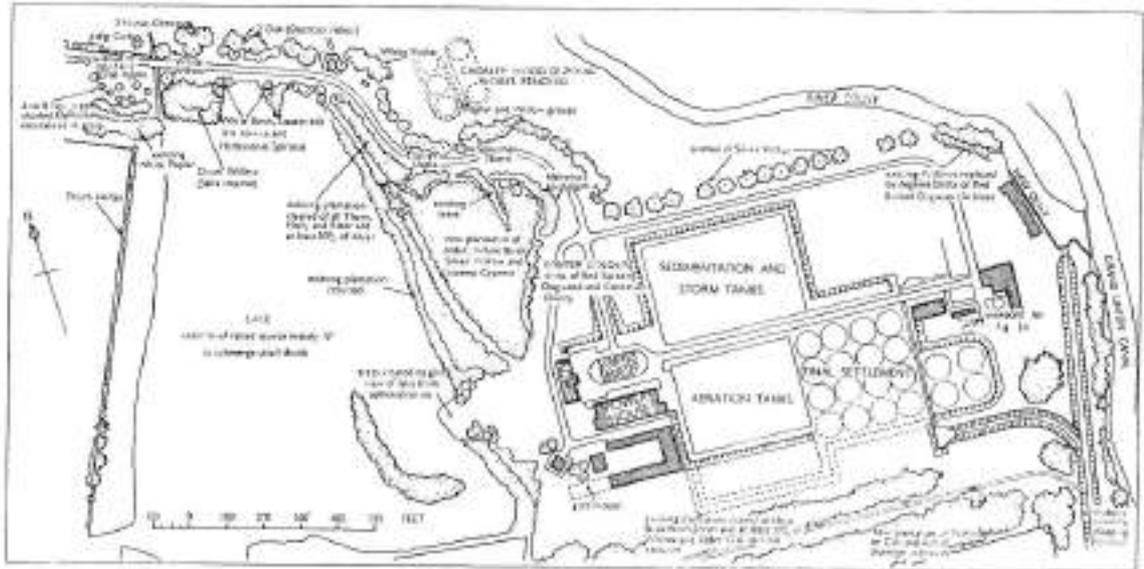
A. Tree planting and surface modelling in 1960 at Maple Lodge Sewage Disposal Works, Rickmansworth
